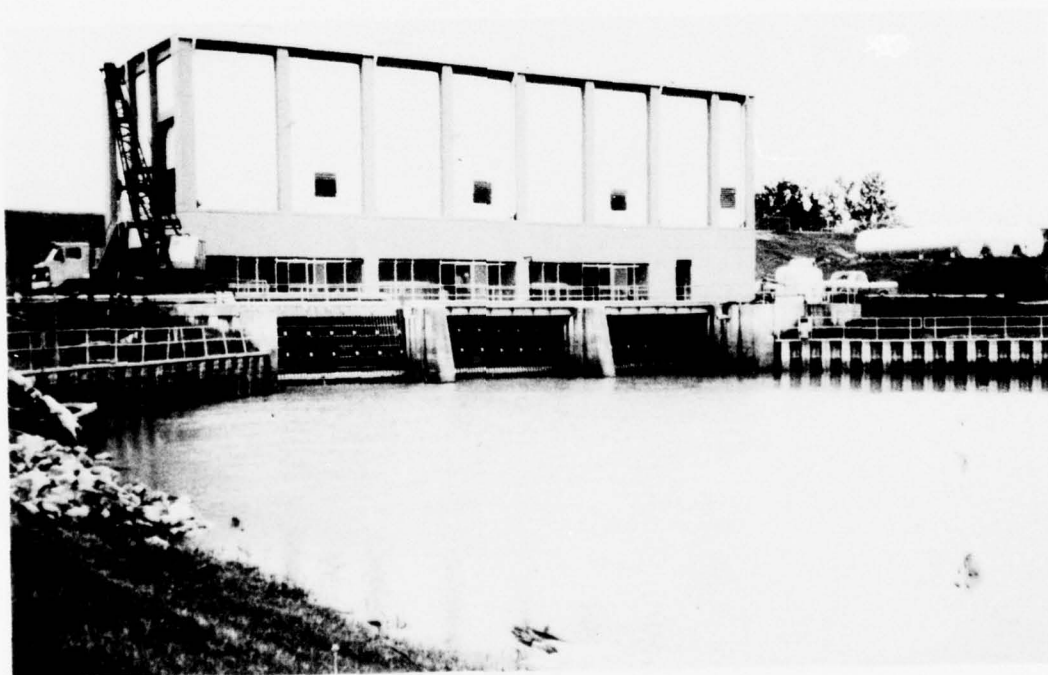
Entrance to sump, 45-deg wing walls, rounded pier noses,
